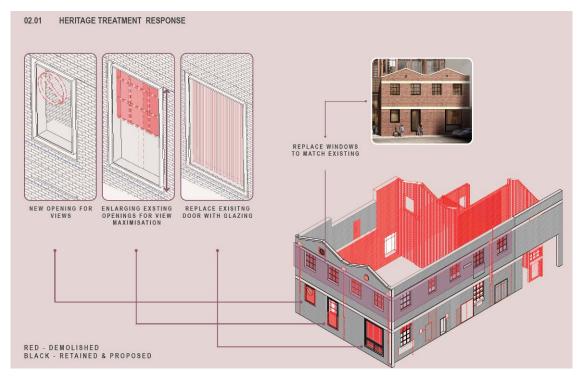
Isometric elevation of retained built form showing proposed external alterations
